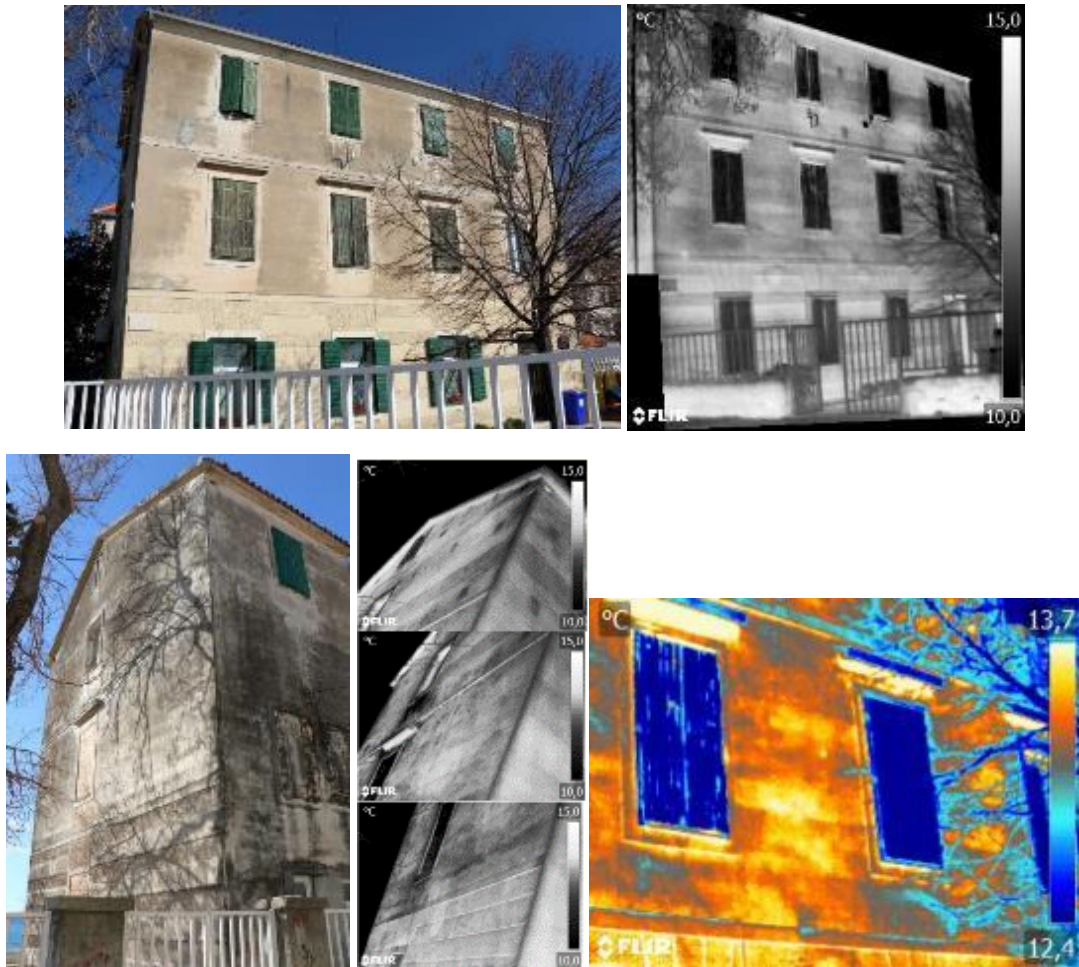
Kindergarten Don Klementa Tadina 2: Horizontal lines are clearly depicting layer of concrete made in technique of poring 40 to 50 cm of concrete into wooden framework while differences in temperature conduction is caused by segregated concrete with poor mechanical properties.
